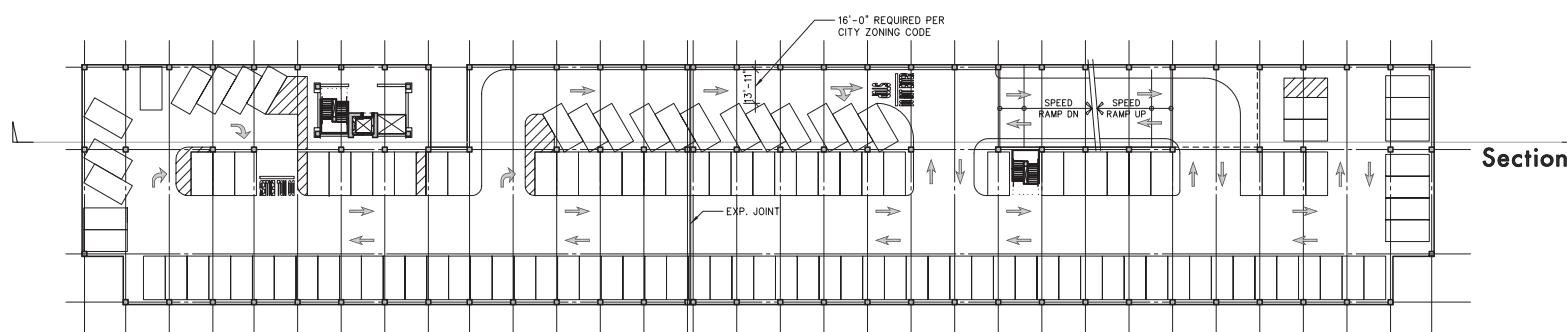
City-owned Depot Site Garage Layout Plan
